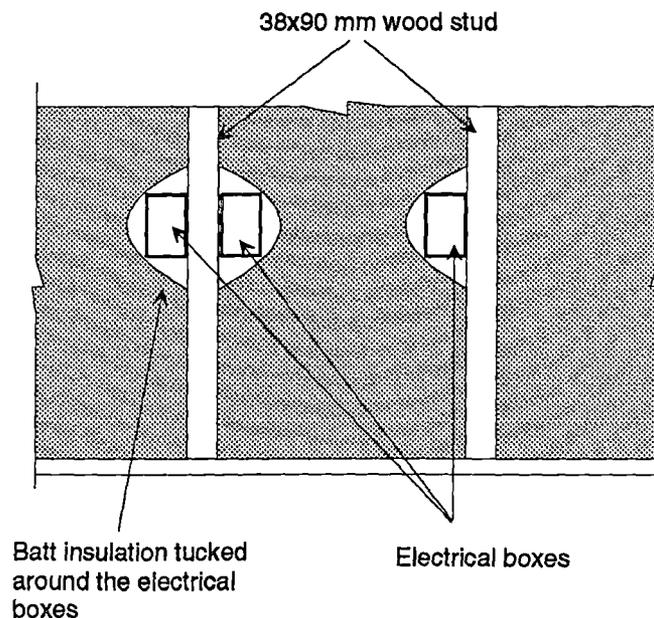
Sketch of a vertical wall section showing the insulation 'displaced' around each electrical box. Note that boxes are exposed to adjacent airspace behind the box, or to each other in case of back-to-back outlets.
